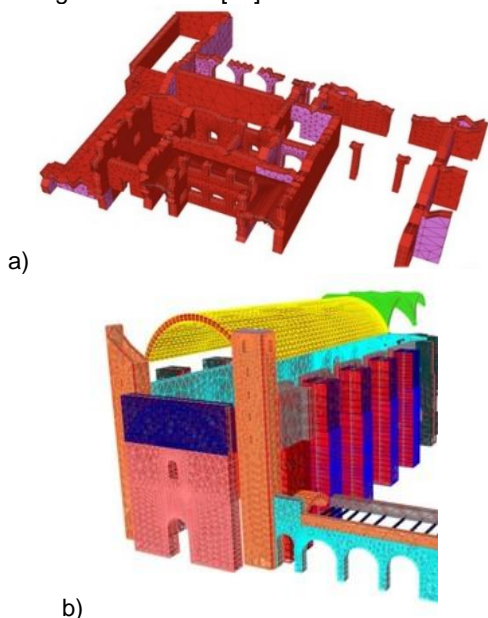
Structural modeling of the heritage building, a) aerial view of the initial construction of the shell finite element model, b) geometric-constructive breakdown of the main nave of the church: vaults, buttresses, arches, walls and wooden beams, to understand the construction system. Images taken from [21]
